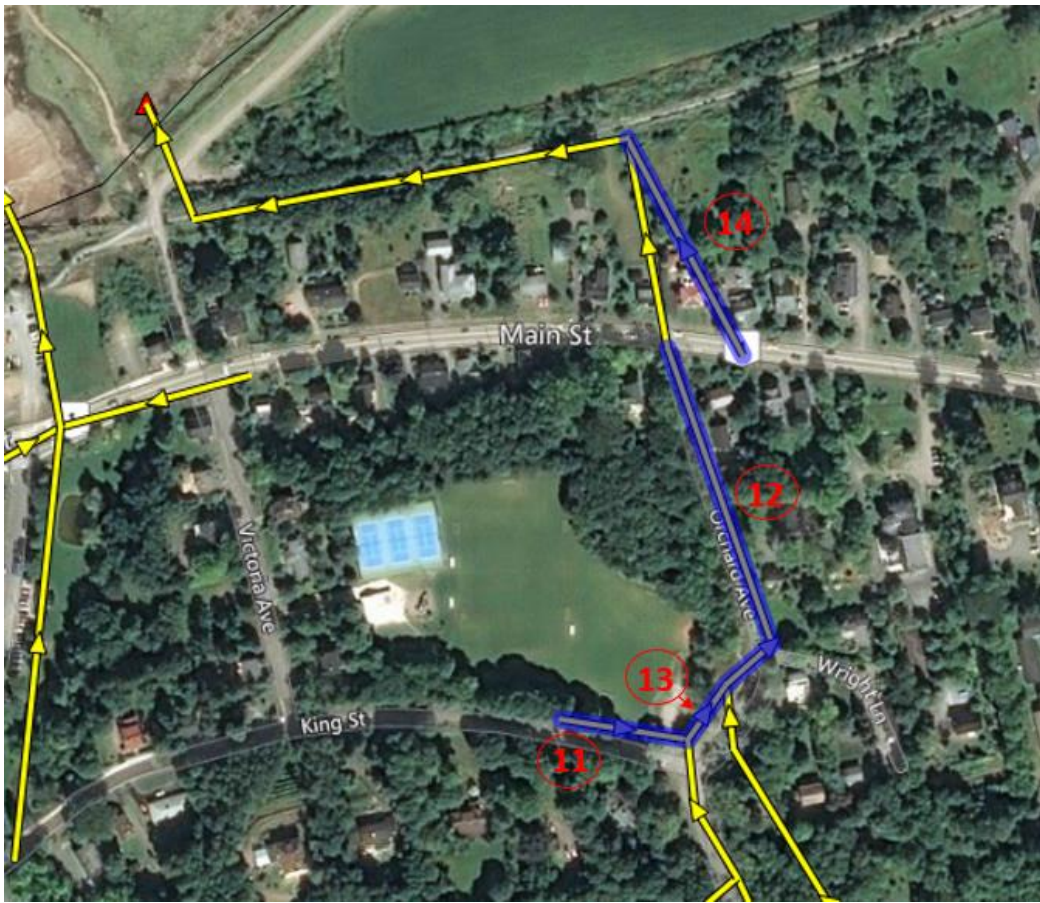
Proposed Upgrades for Stormwater Pipes near Orchard Avenue and Main Street
